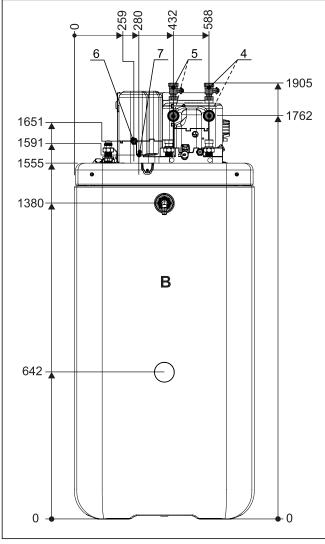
Dimensions, side view - Type ...04P50D/...08P50D
